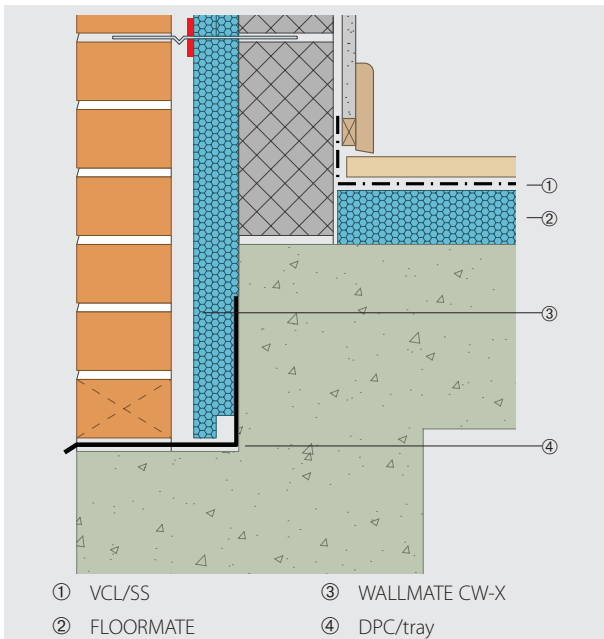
>> Exposed wall/floor junction, insulation applied internally
